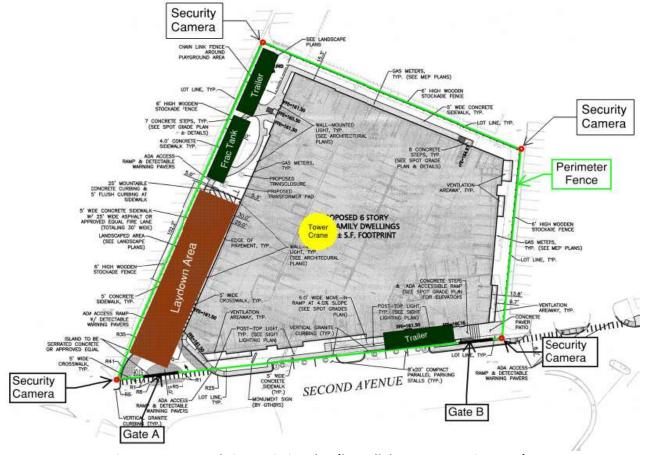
Proposed Site Logistics Plan (by Callahan Construction, Inc.)
